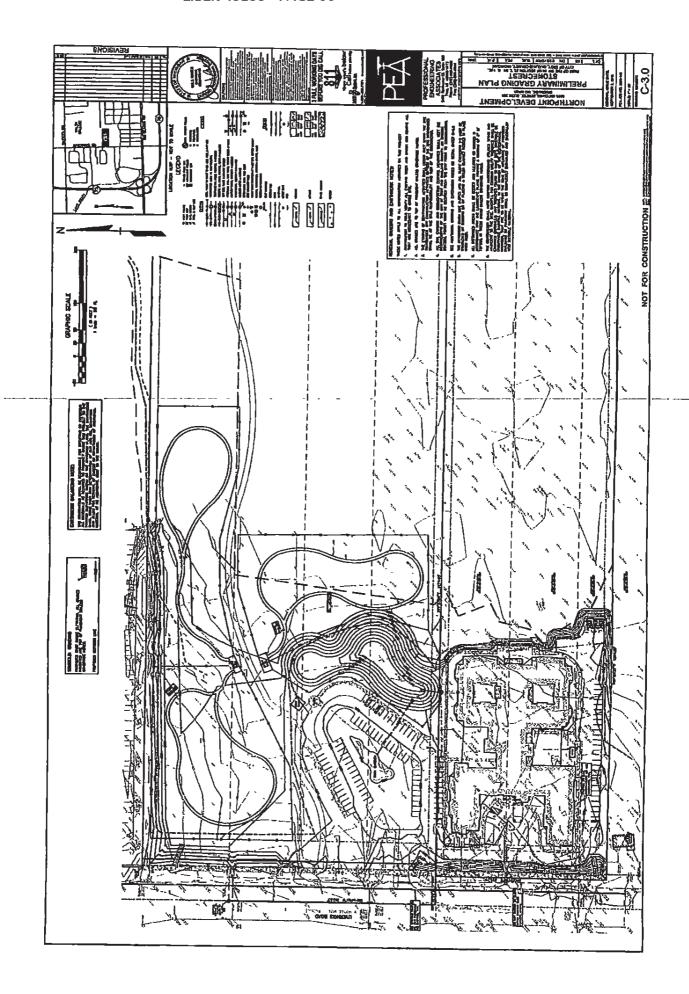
# EXHIBIT D PRELIMINARY DEVELOPMENT PLAN
